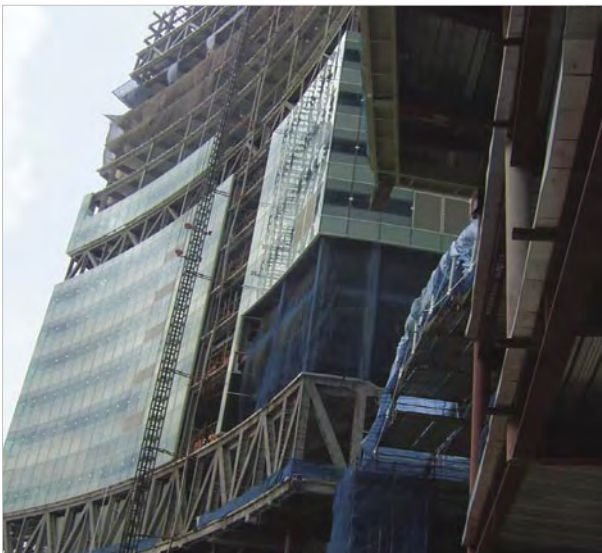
Curtain wall systems: Saves time, better quality facade
